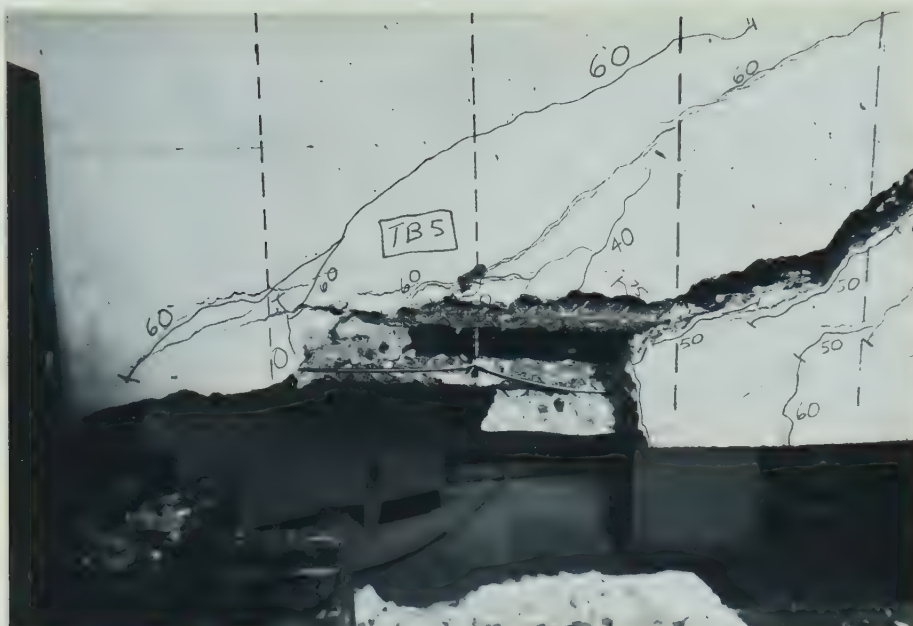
Damage to anchorage at bottom of failure crack in TB 5
